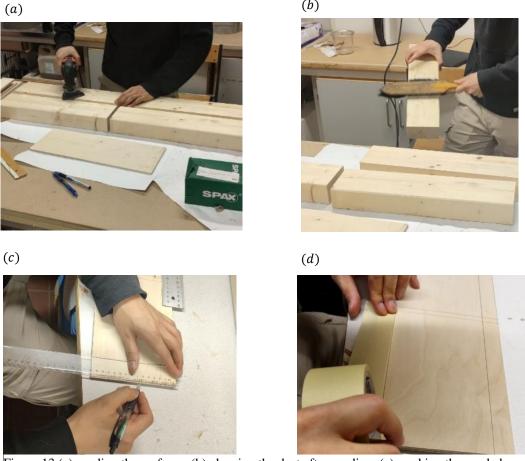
(a) sanding the surfaces, (b) cleaning the dust after sanding, (c) marking the needed dimensions for the glue, (d) taping
